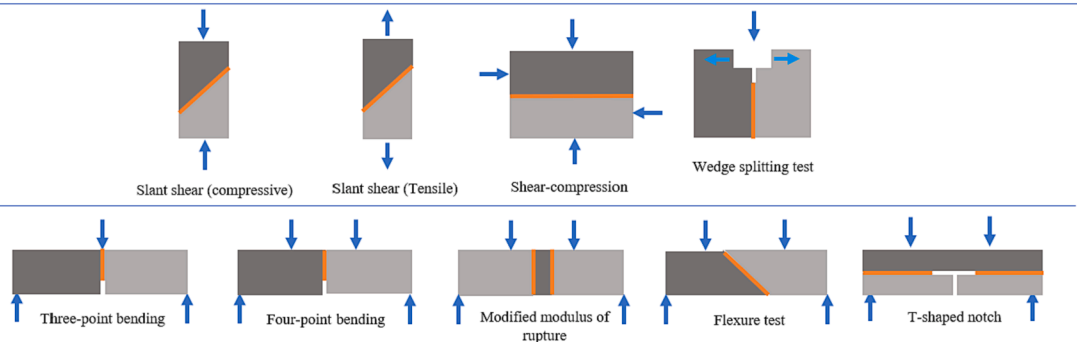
Schematics of different test methods used to assess concrete-concrete bond strength.
